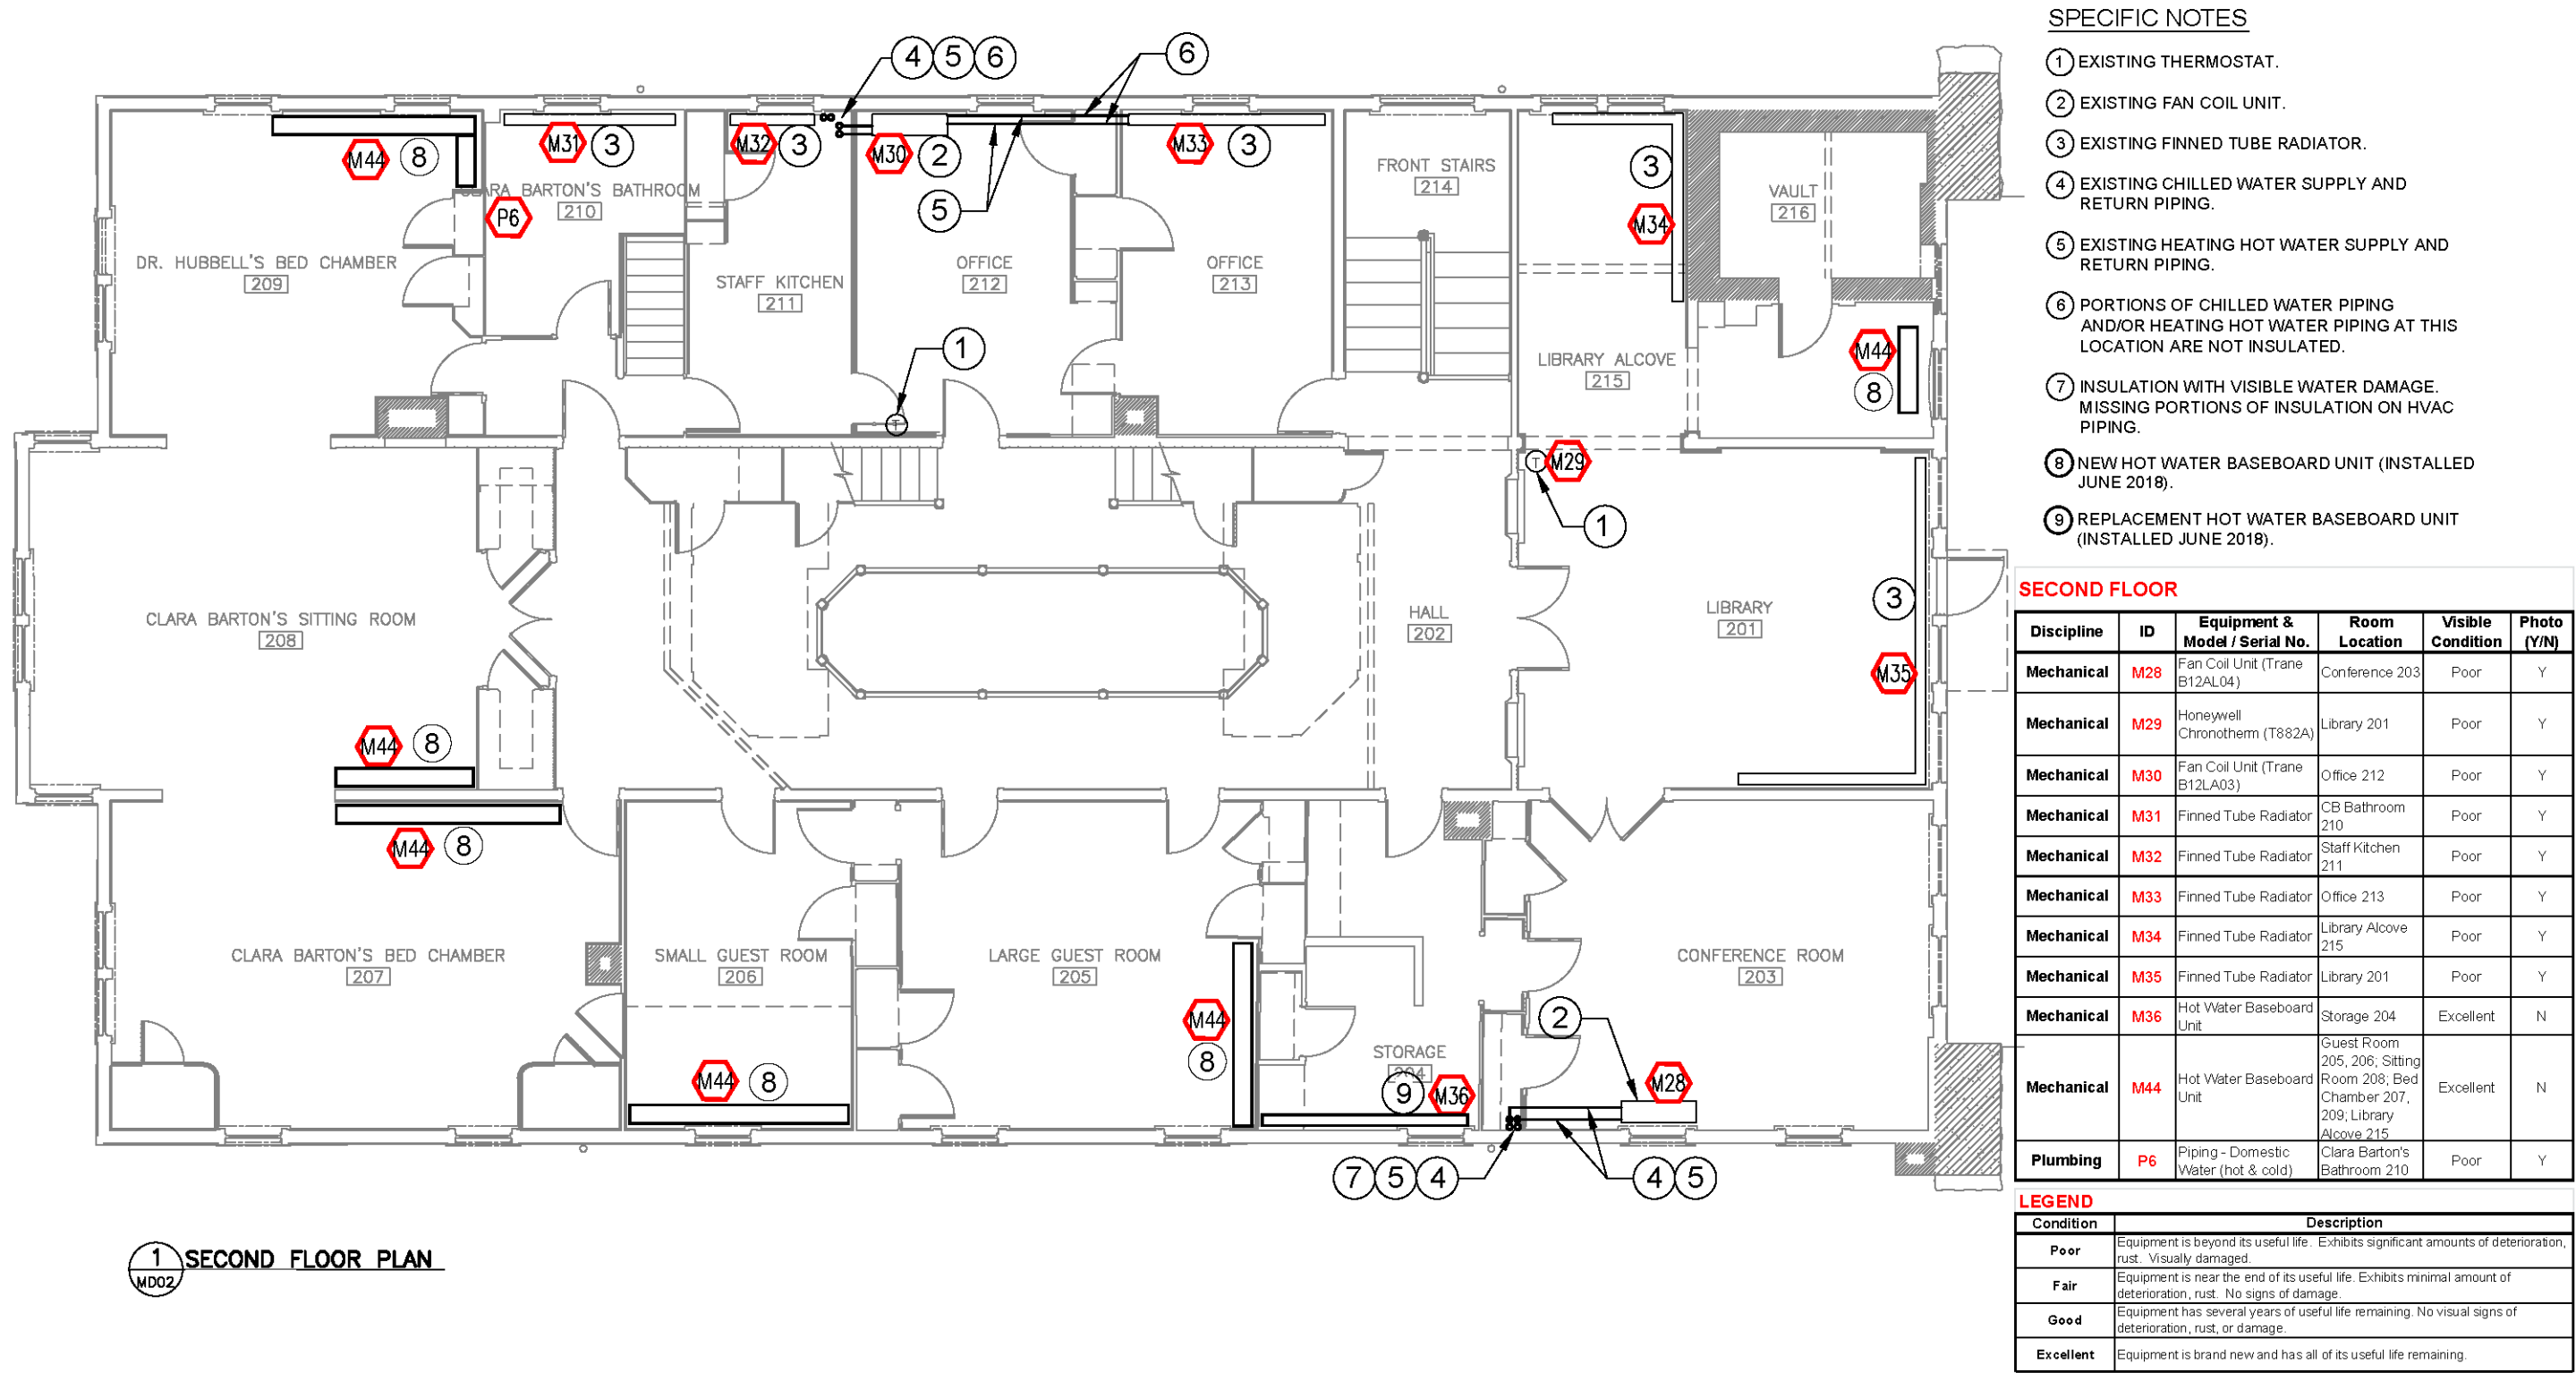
Mechanical / Plumbing Existing Conditions Plan - Second Floor
